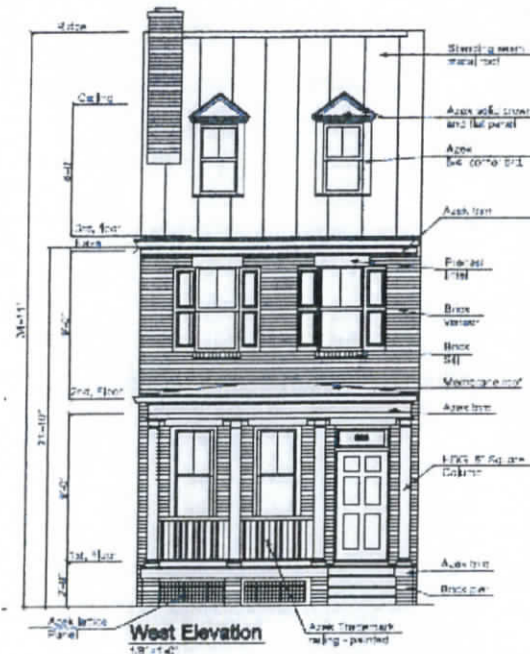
Approved but as yet Unconstructed New Townhouse at 606 S Fairfax
